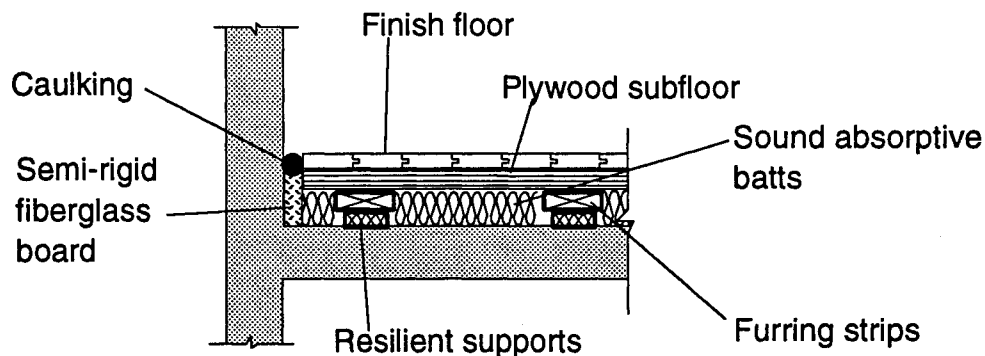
Example of lightweight wood floating floor supported on resilient pads. The floating slab should not be in contact with the main building structure nor the structural slab below.
